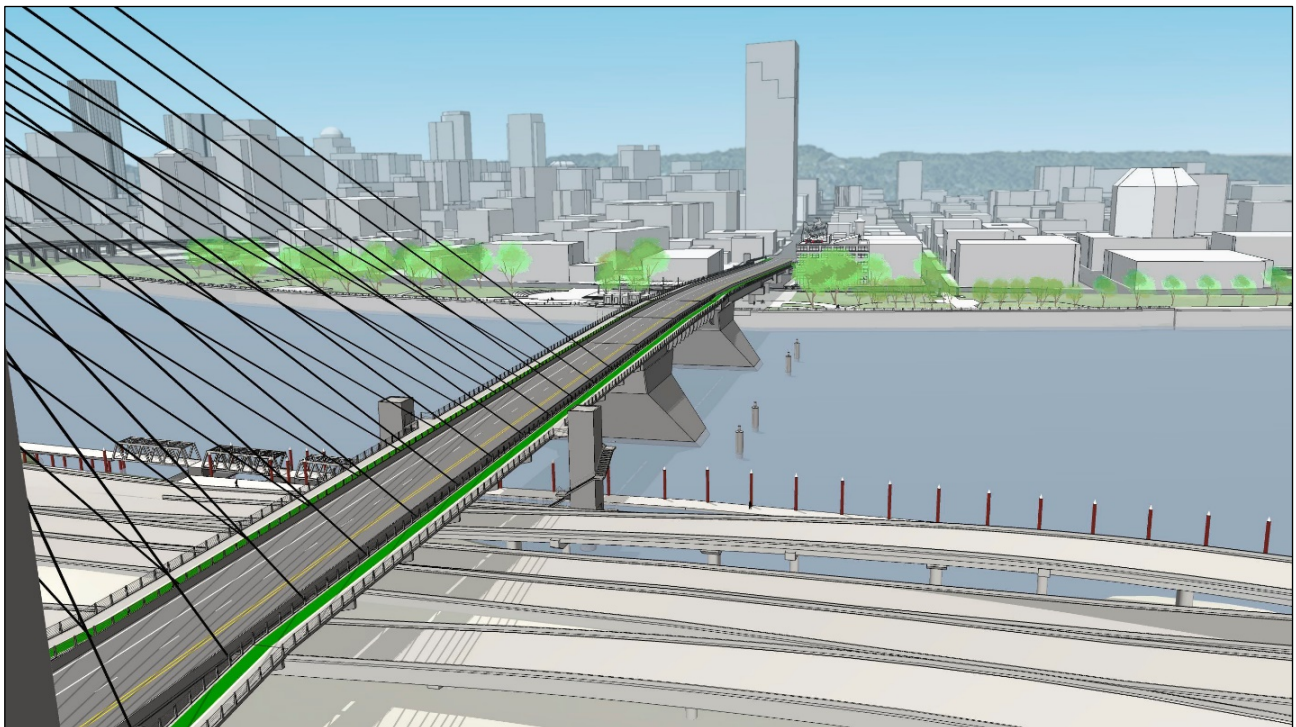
Span Combination 3 (girder west approach, bascule central span, cable supported east approach), artist's rendering, view looking southwest (Fat Pencil Studio, 2021).
